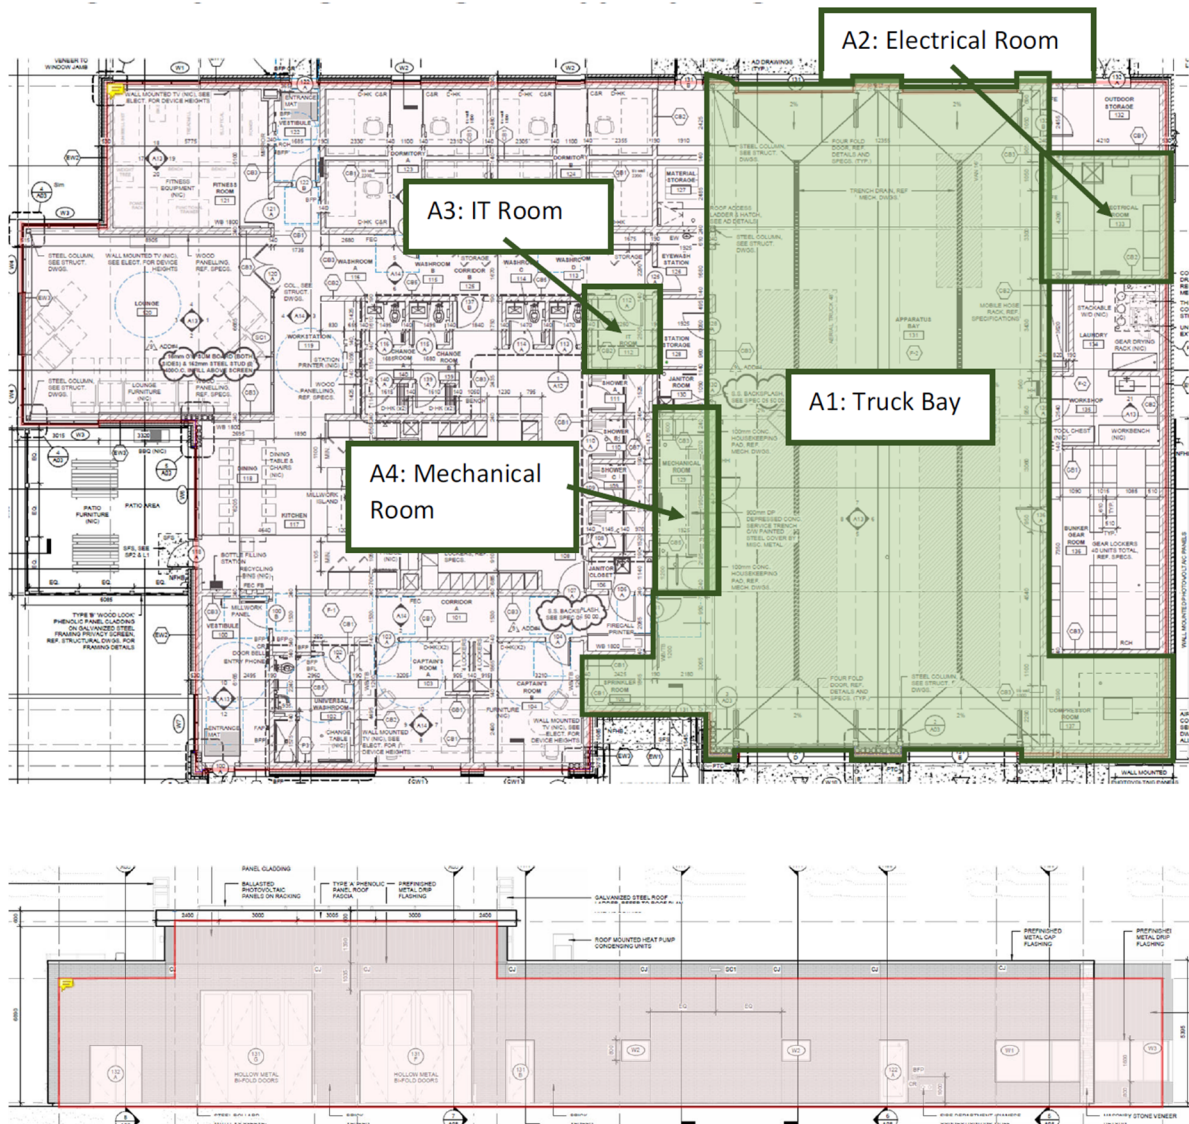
Building enclosure drawings identifying test boundary and auxiliary spaces included in the test
